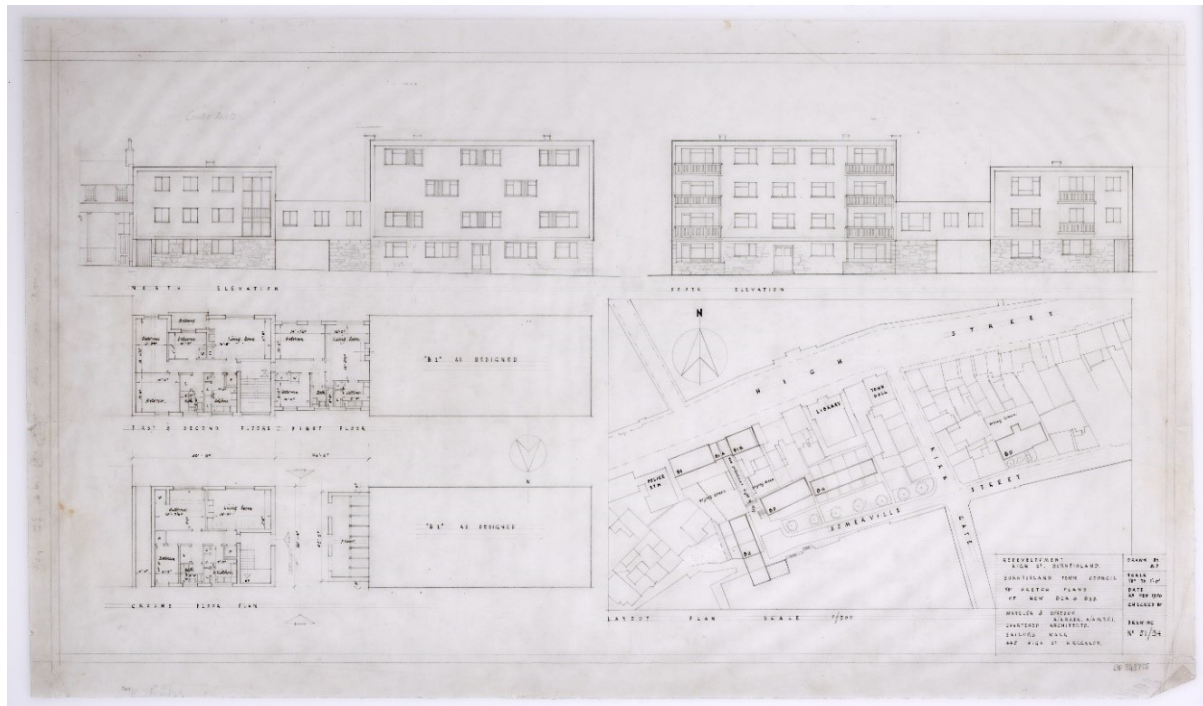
‘Sketch Plans’ of Somerville Street/ High Street Development (Job 51), showing elevations and plans of High Street ‘B1’ blocks, 29th February 1956.
